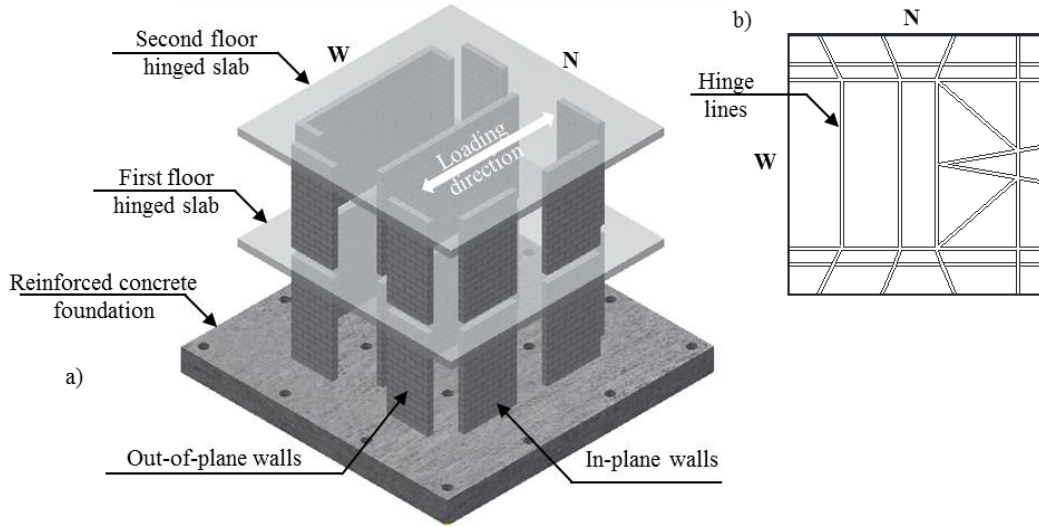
Building II* configuration; a) Isometric view from East-South direction; b) RC slab detailed with hinge lines.
